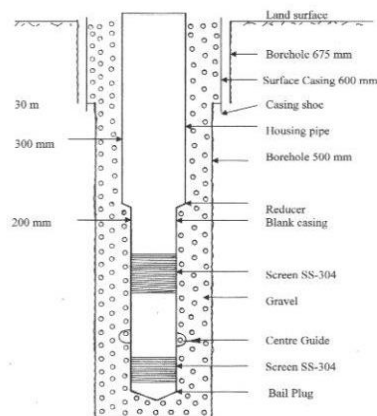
WELL COMPLETED WITH ROTARY METHOD
